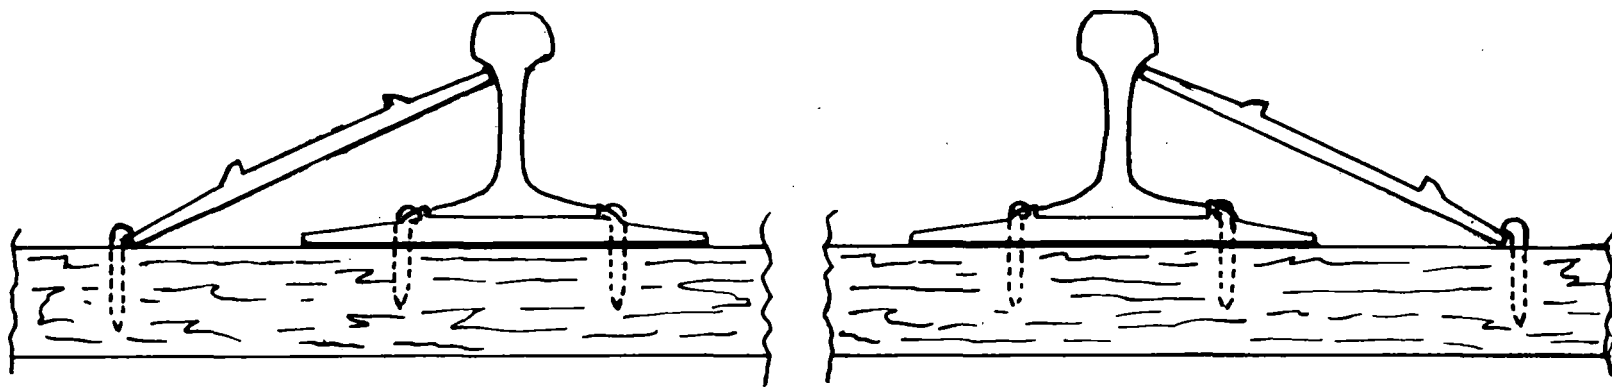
Rail Restraint Mechanism Used in the Gage Widening Tests.
